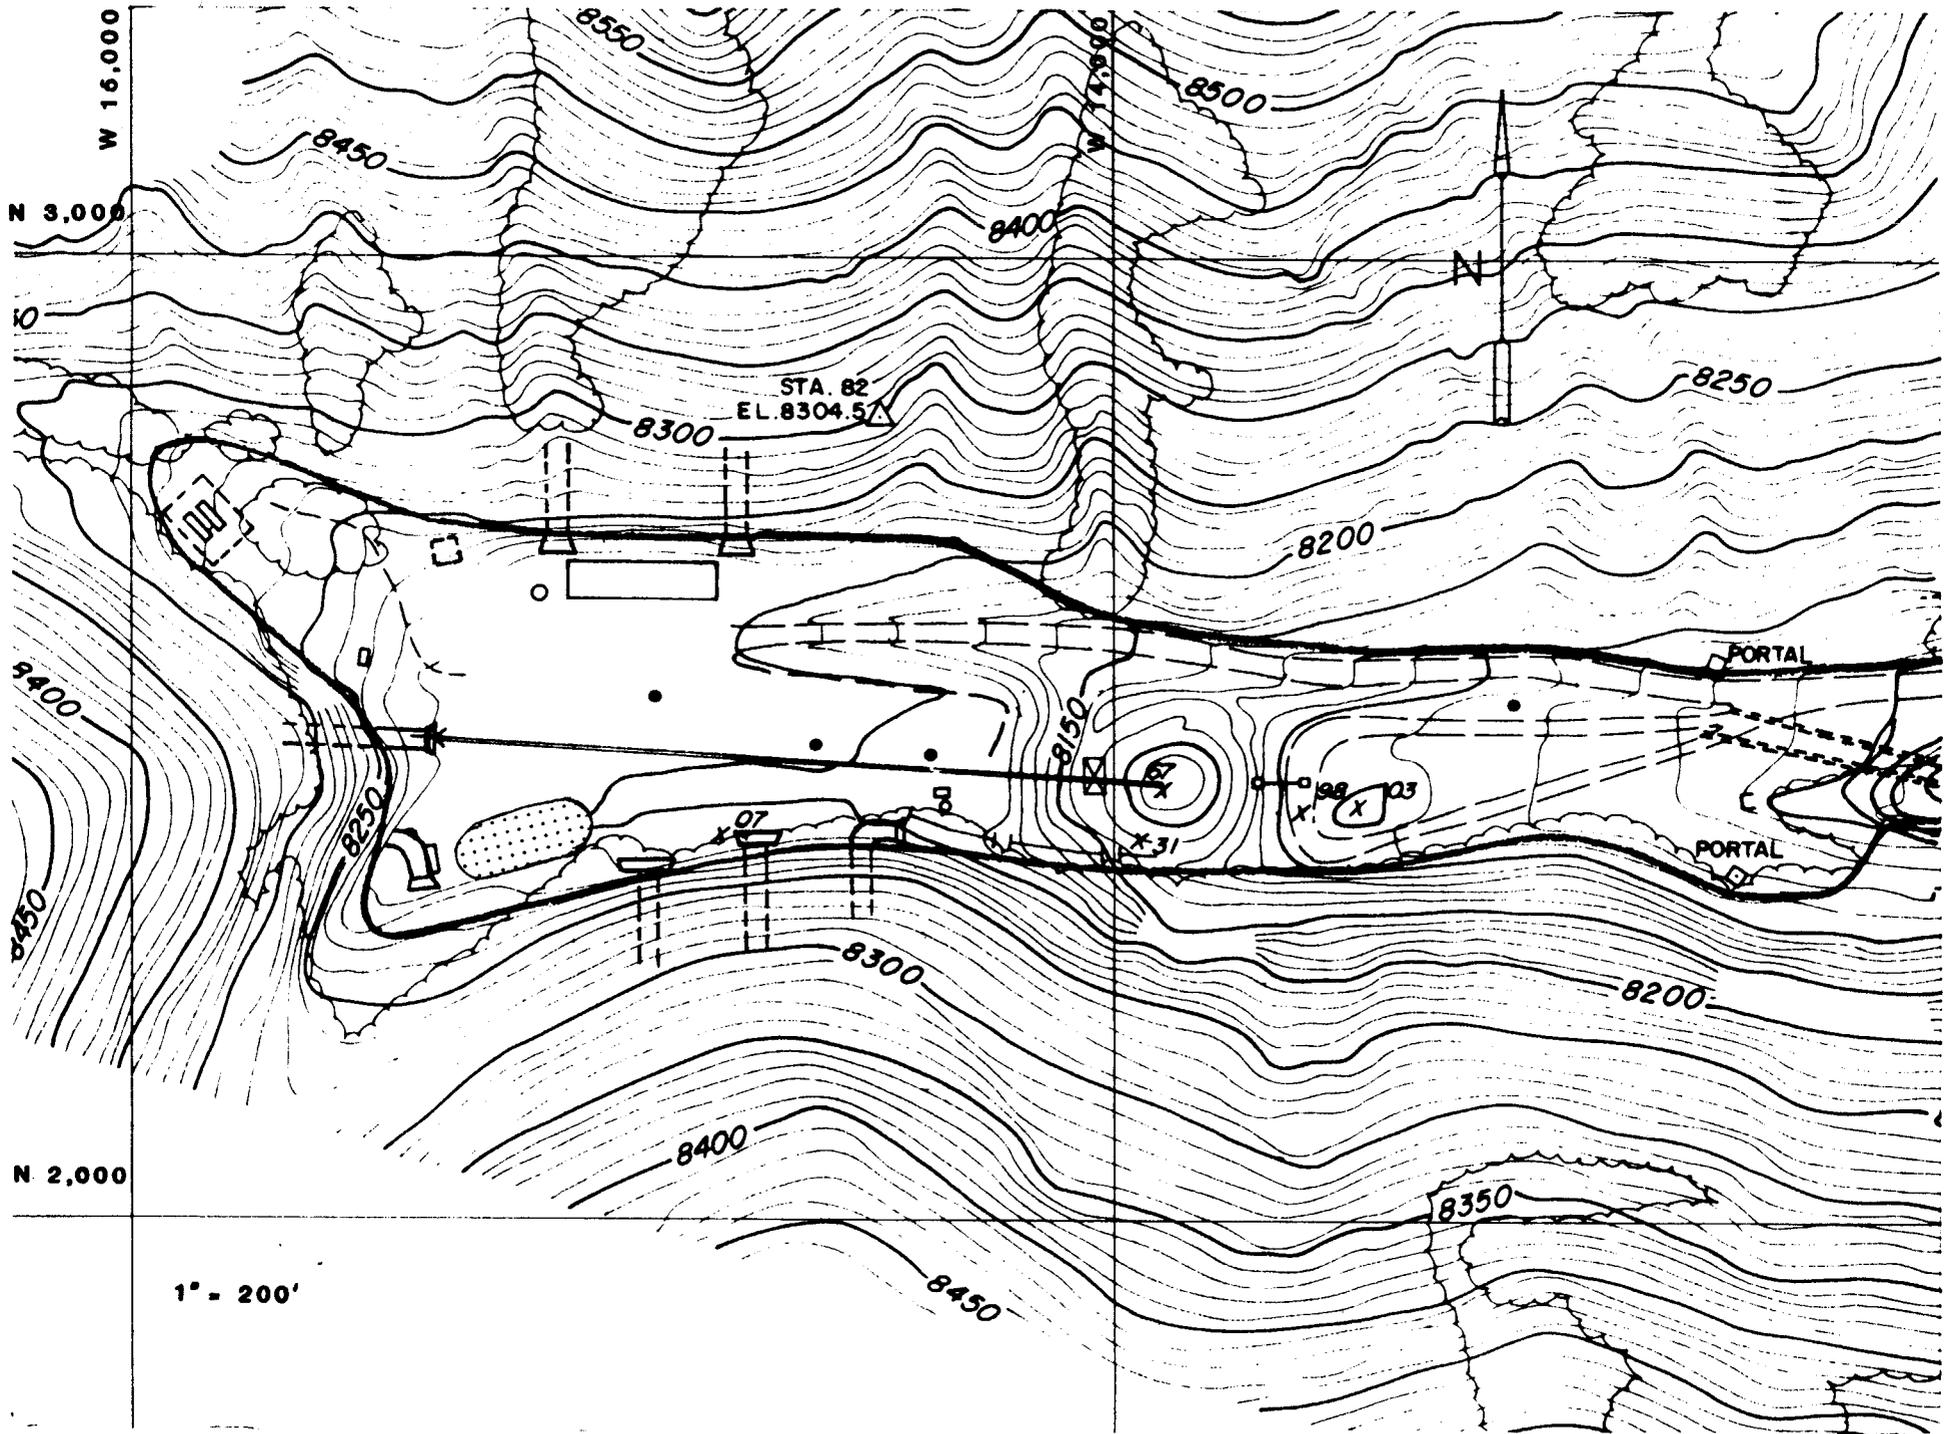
MIDDLE FORK TEMPORARY UNDERGROUND DEVELOPMENT WASTE STORAGE SITES
